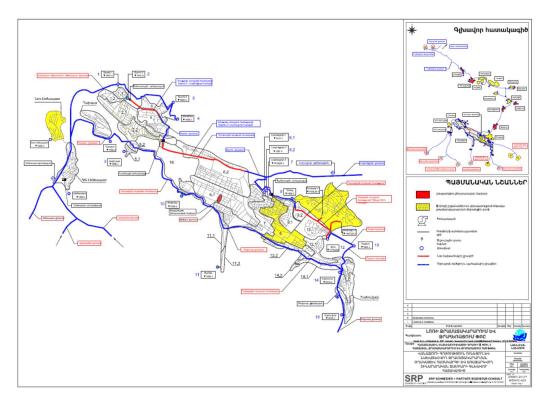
Proposed location of the Construction Camp at Vanadzor
